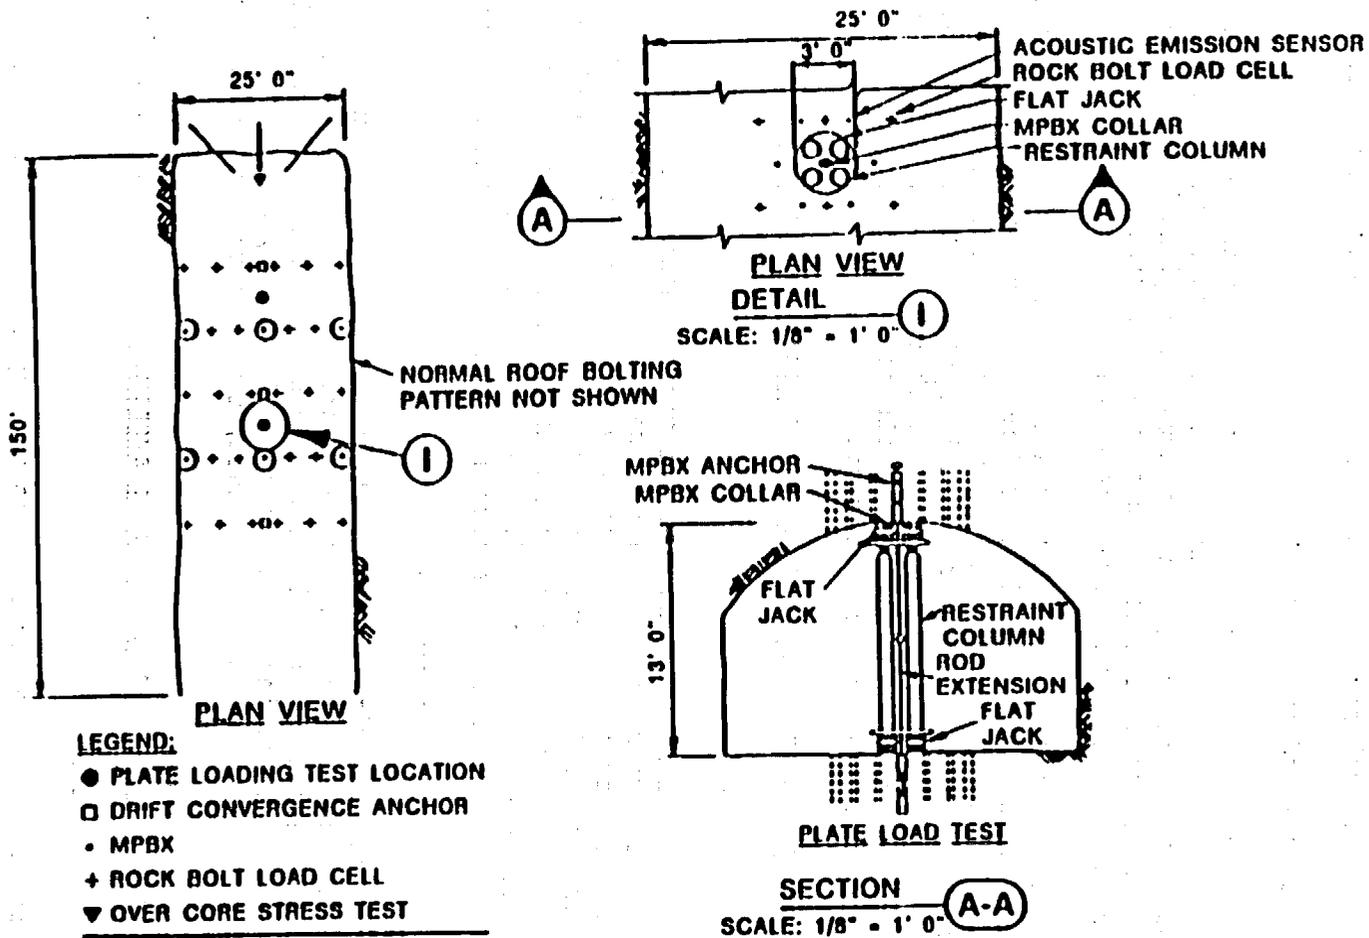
PLATE LOADING TEST LOCATIONS IN DEMONSTRATION BREAKOUT ROOM
